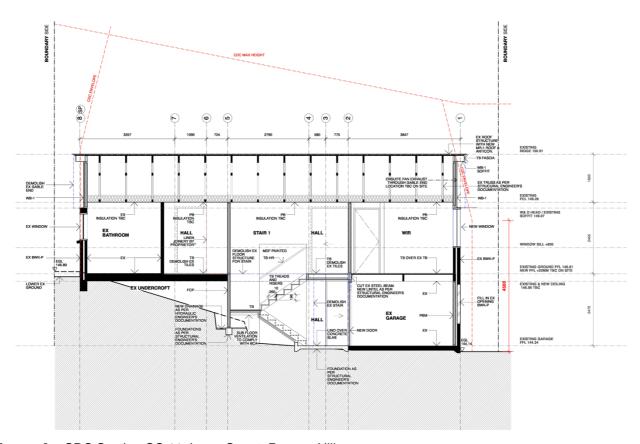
CDC Section CC 11 Jones Street, Beacon Hill
